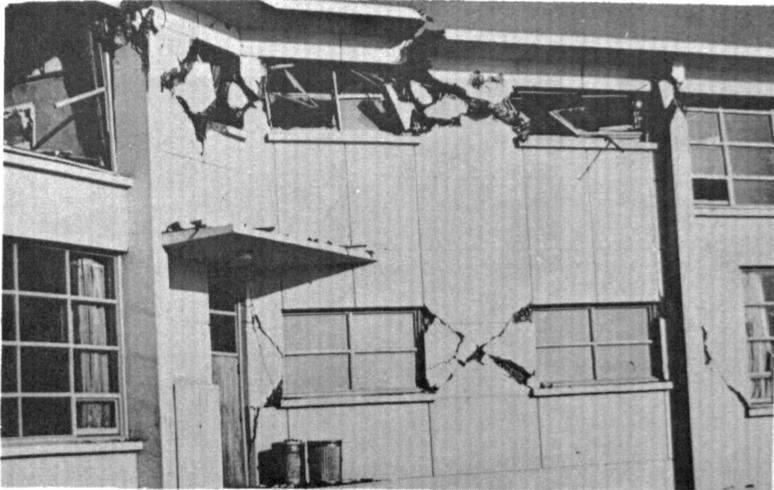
Portion of the severely damaged West High School, Anchorage.
